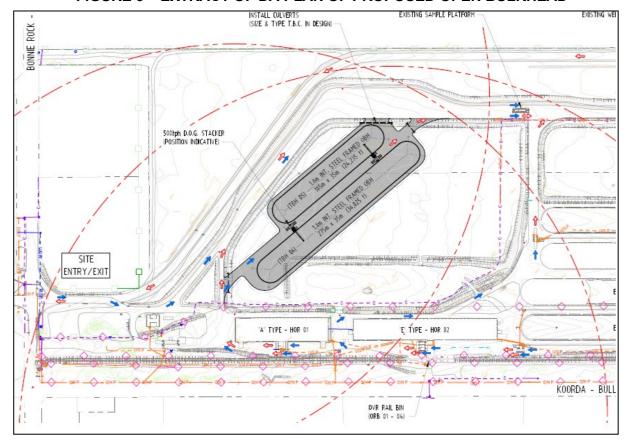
EXTRACT OF DA PLAN OF PROPOSED OPEN BULKHEAD
